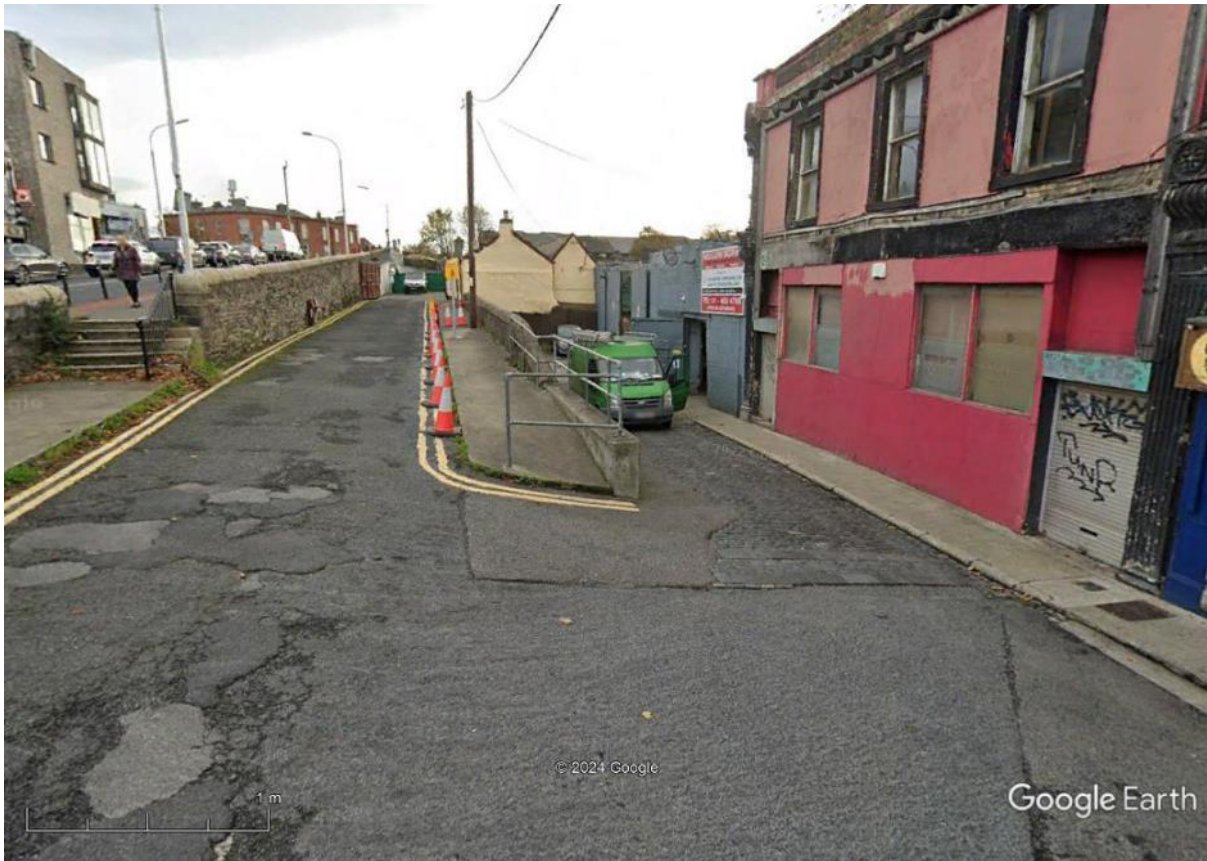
Street View of the Location from within Plot 1022 showing the Retaining Walls
